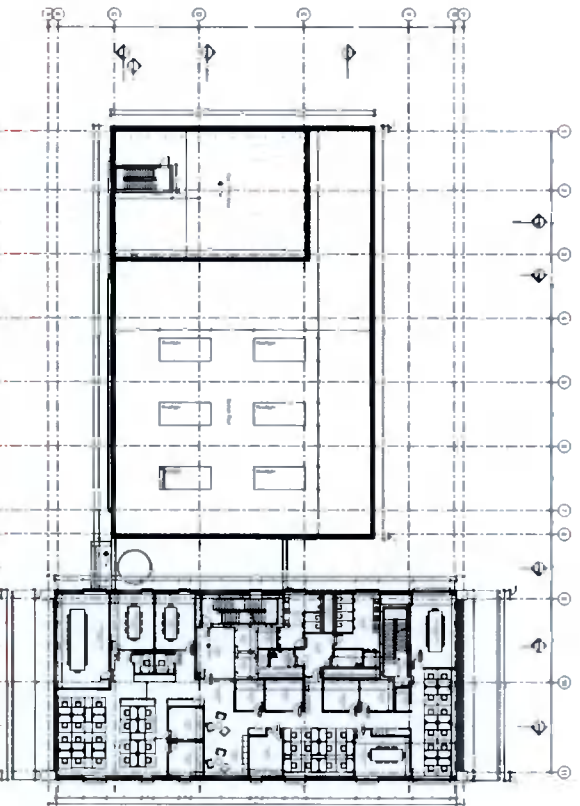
C.A.B. Proposed 1st Floor Plan (Level 02) (image updated)
